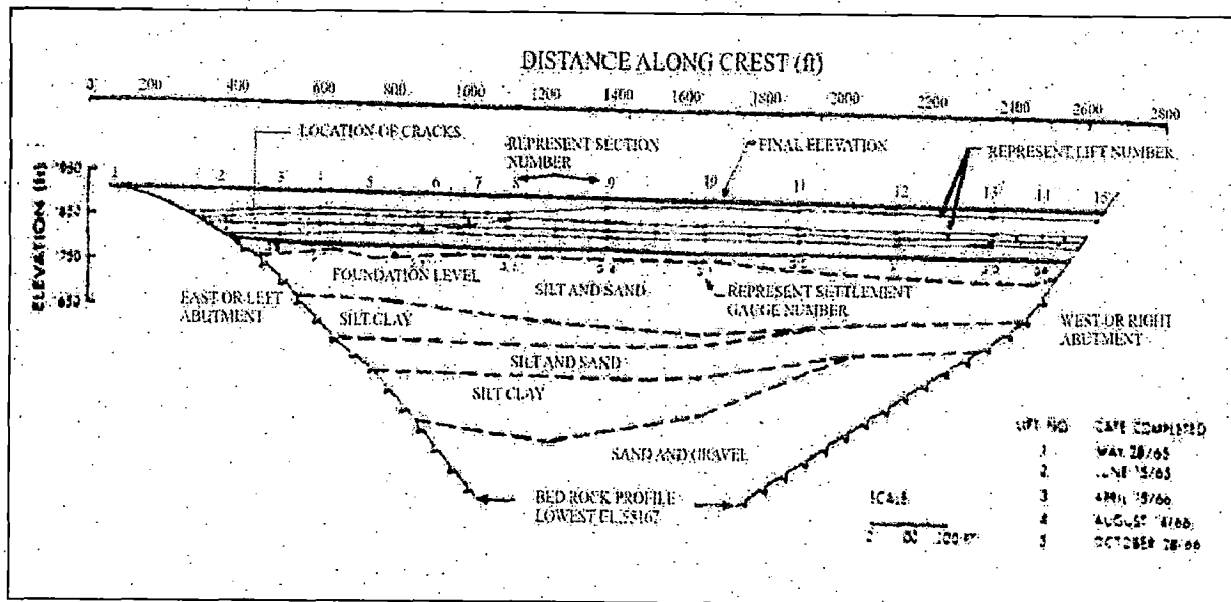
(b). Longitudinal section of Duncan Dam and foundation showing construction sequence and location of crack
